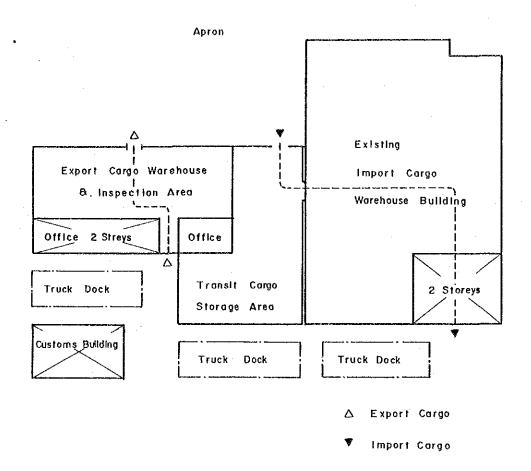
Conceptual Plan of Cargo Terminal Buildings
